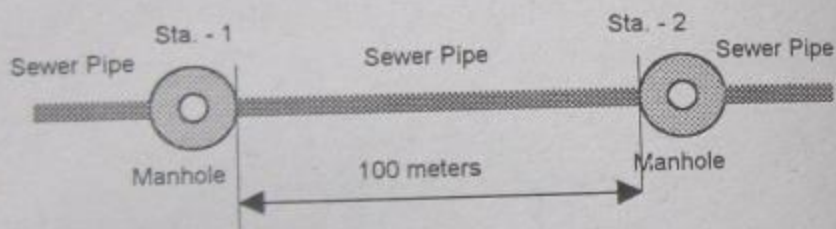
MANHOLE OF PUBLIC SEWER LINE
